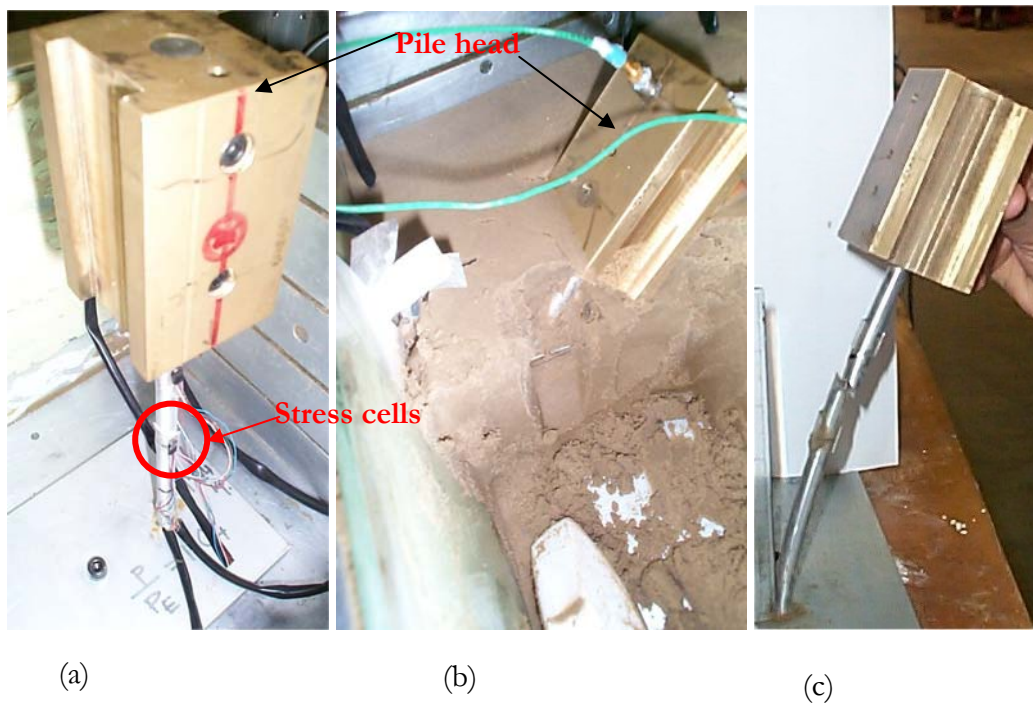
Pile 10 in test SB-06; (a): Stress cells attached to the pile; (b): The pile during excavation; (c): Deformed shape after the excavation.
